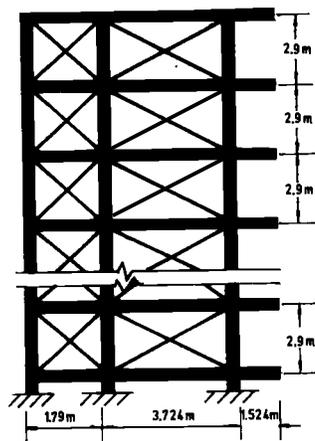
Side Elevation of 10 storey building (Fixed-Base)
